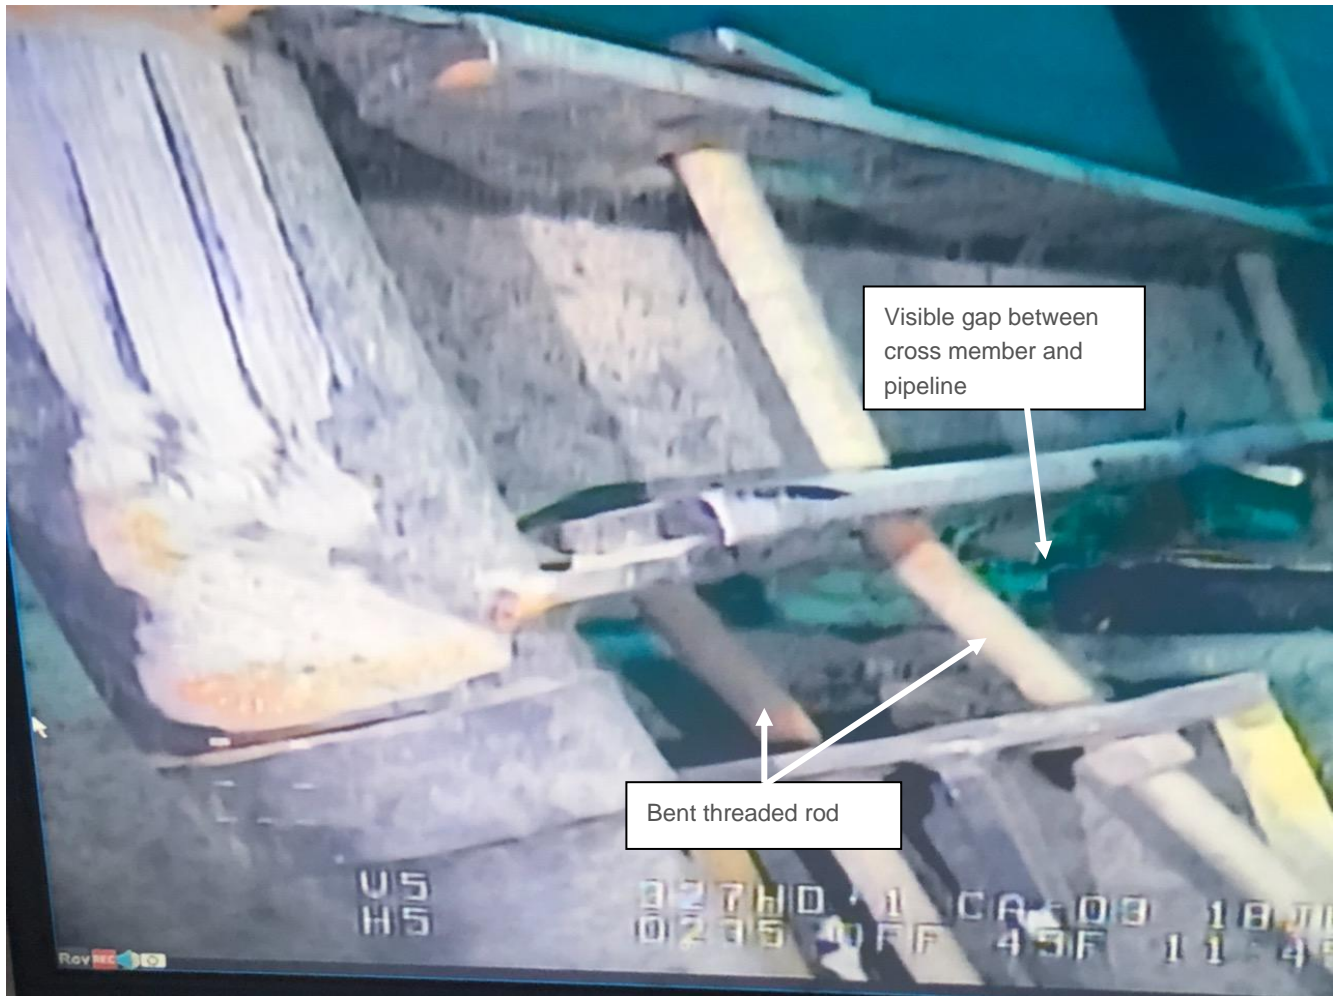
Damaged Threaded Rod Assemblies and Pipeline Gap to Cross Member
